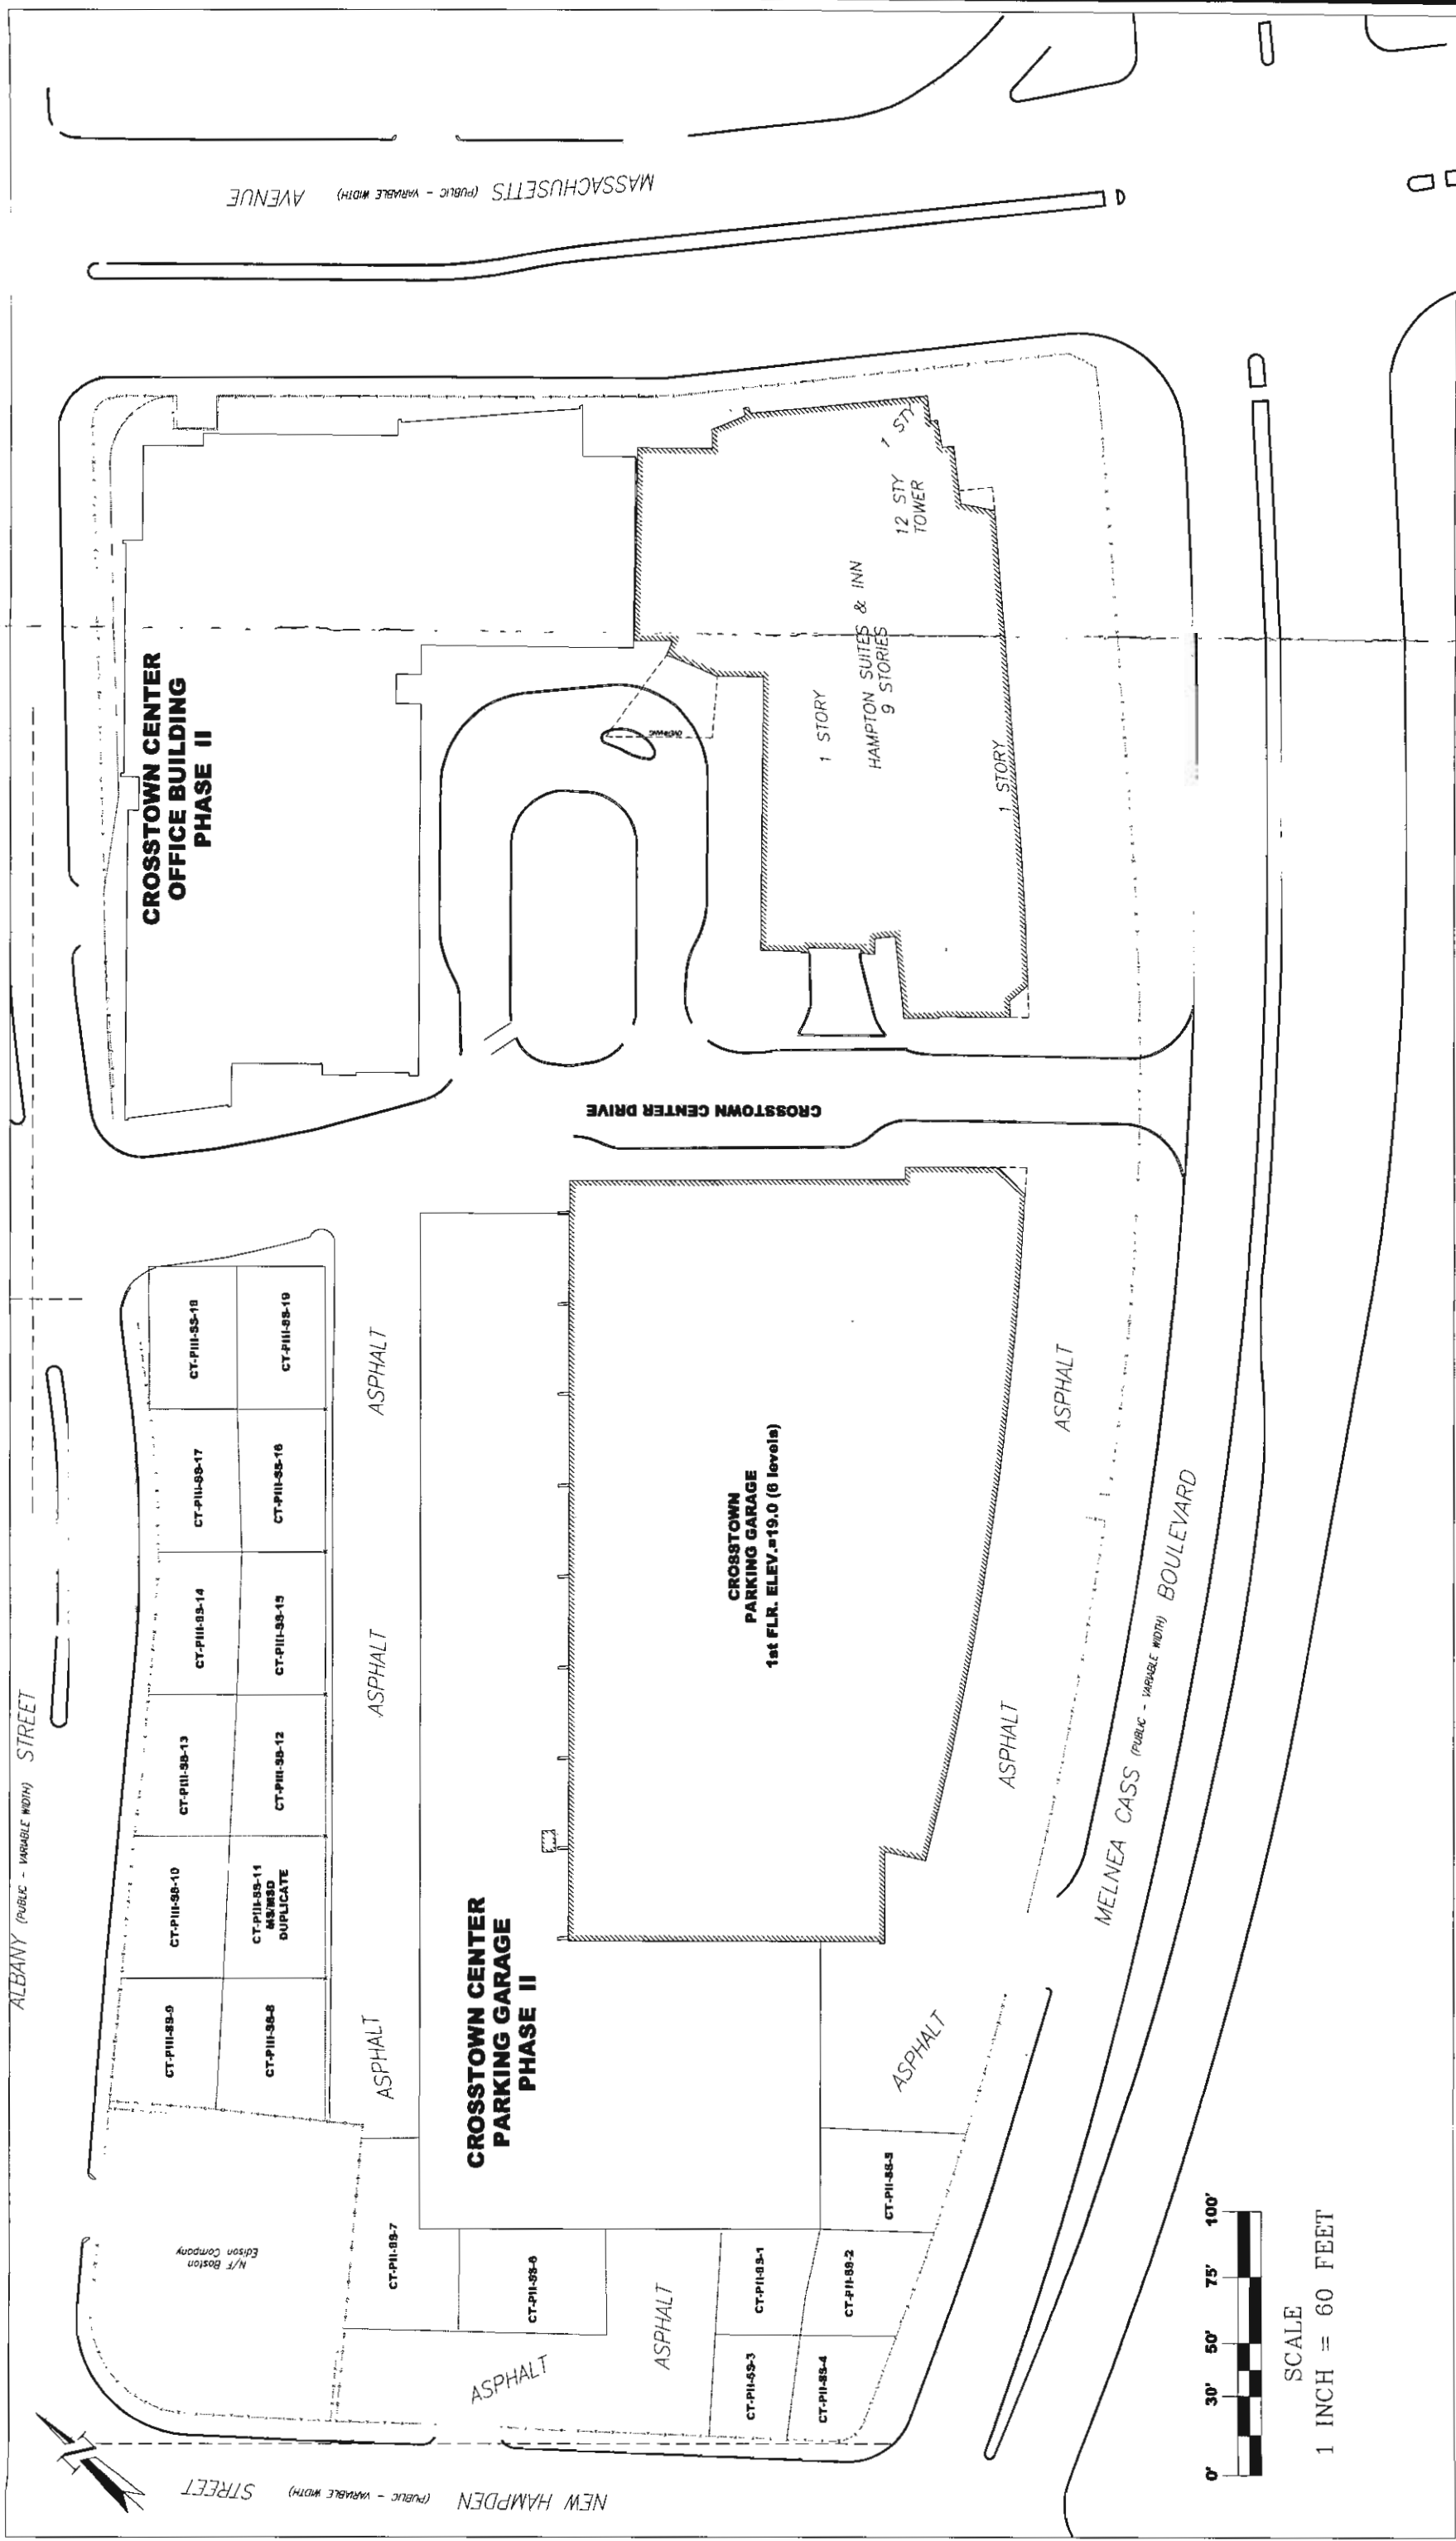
POST-CONSTRUCTION SURFACE SOIL SAMPLE LOCATION PLAN
